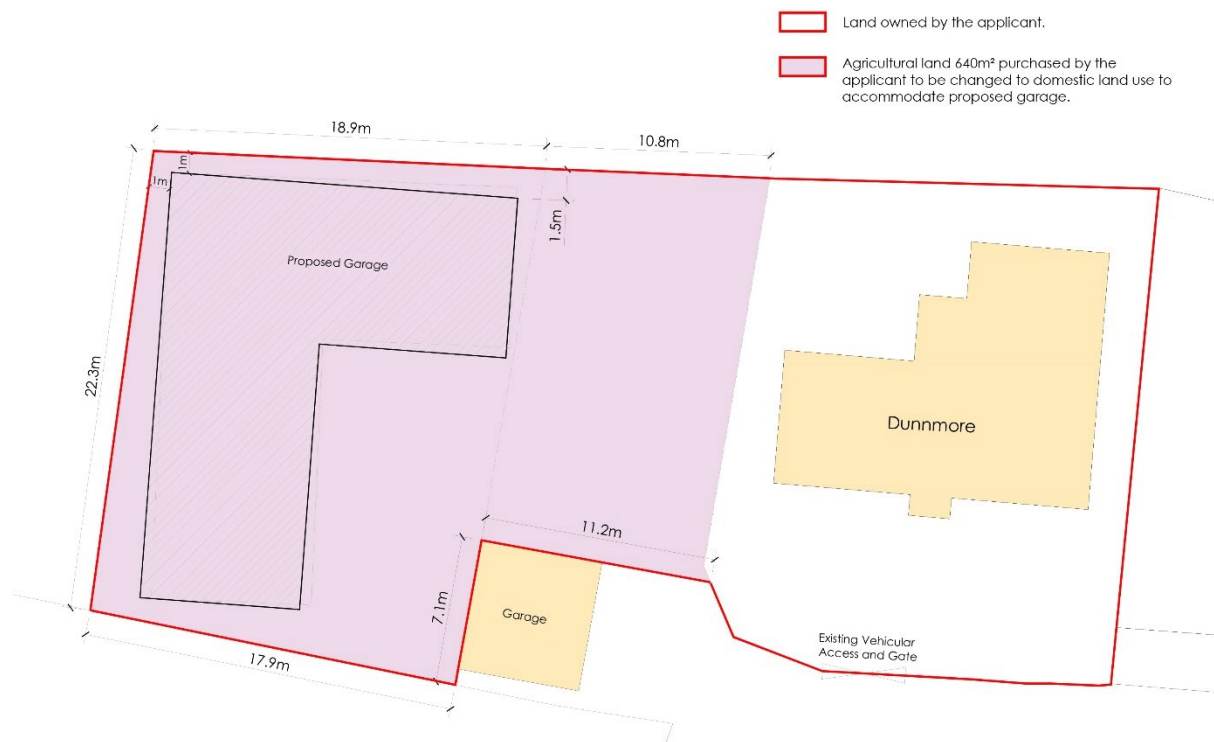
Site plan from application 20/01205/FLL where the pink area is formerly agricultural land that has been changed in use to garden ground. As can be seen from the site plan the footprint of the garage is much larger than that of the house.
